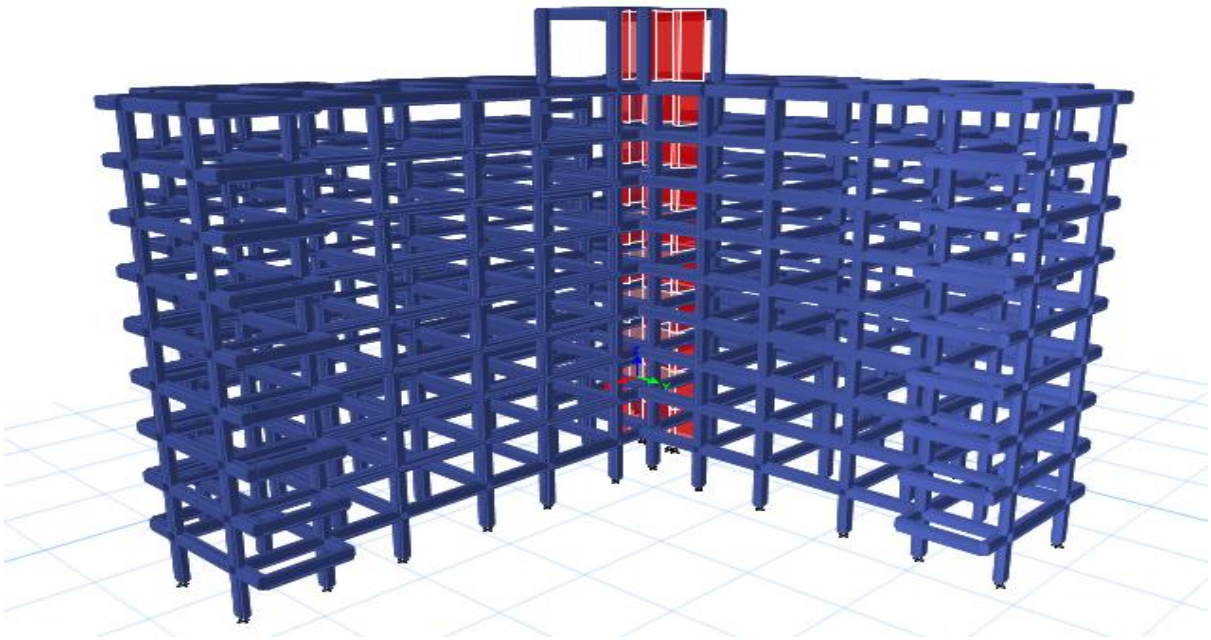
Three dimensional Eight Storey Nonlinear or RC L-Shaped Building with shear wall
